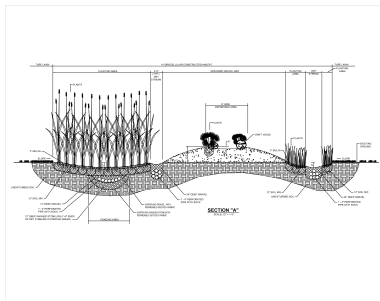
Typical cross-section of an engineered bioswale. Credit: J.O. Evans III and Peter Liginieres, FutureProof LLC.
